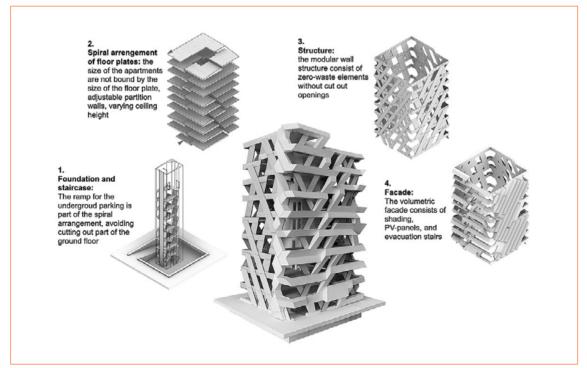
sLender building system. A pre-fabricated CLT multi-storey building up to 8 floors. EKA PAKK team: Dr Siim Tuksam, Dr Sille Pihlak, Dr Eero Tuhkanen, Dr Alar Just, Marko Ründva, Dr Simo Ilomets.
